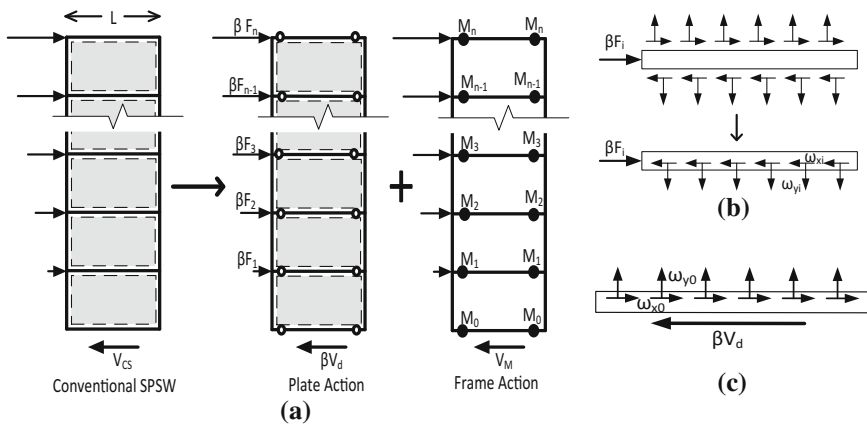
Conventional SPSW a plate and frame action, b forces on intermediate HBE, c forces on anchor beam
